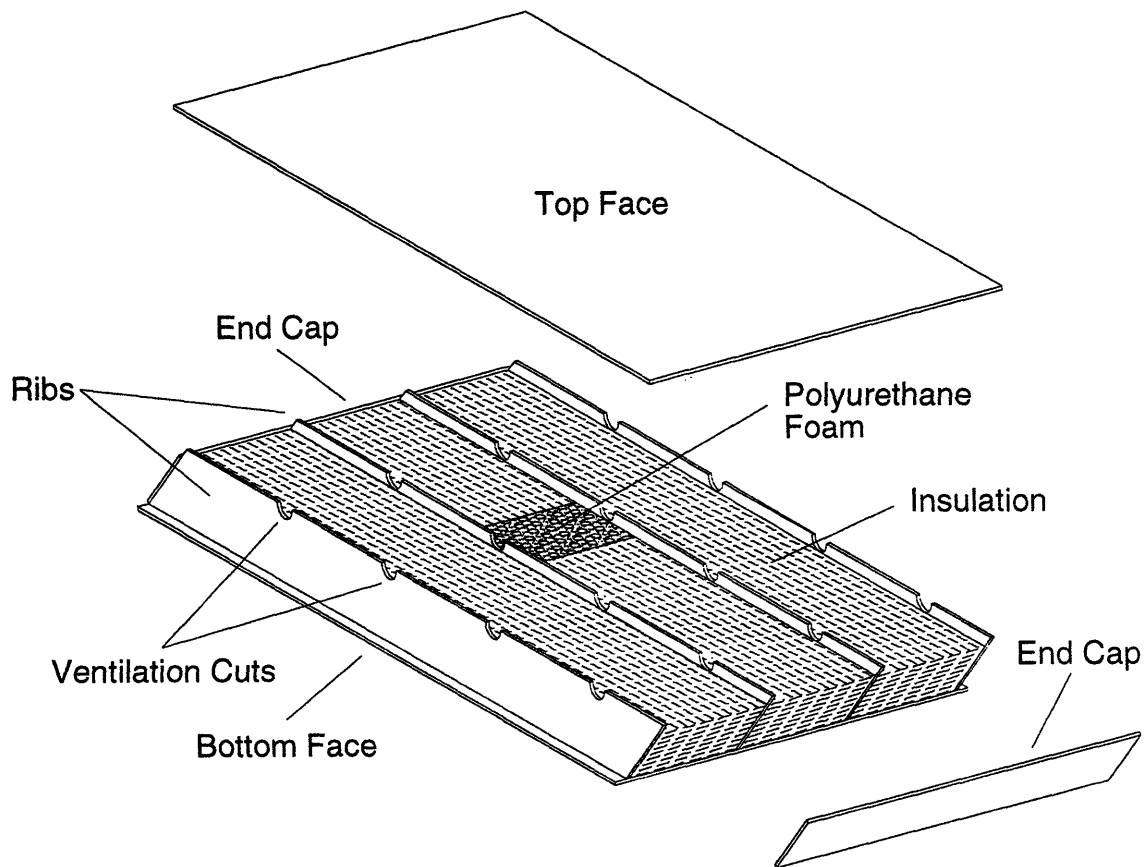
Roof panel structure. The ribs, end caps, and faces are made of Oriented Strand Board.
